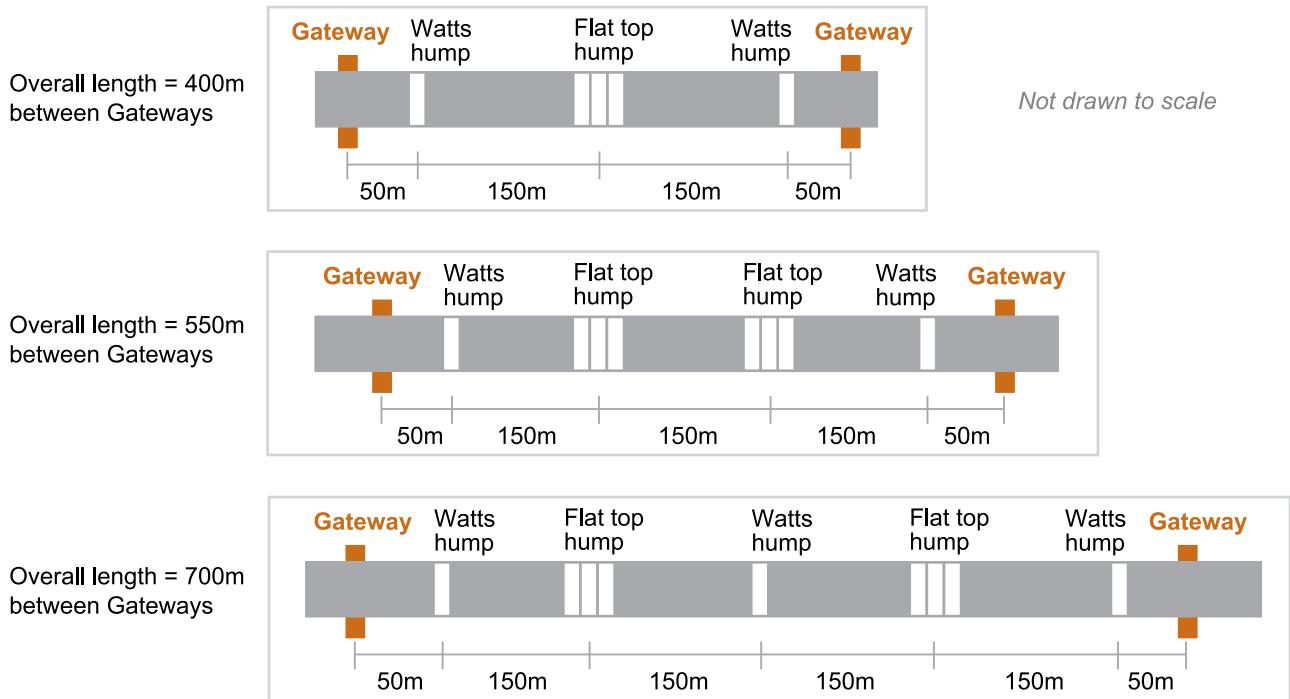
A-7: Village treatment: Typical spacing and combination of road humps
